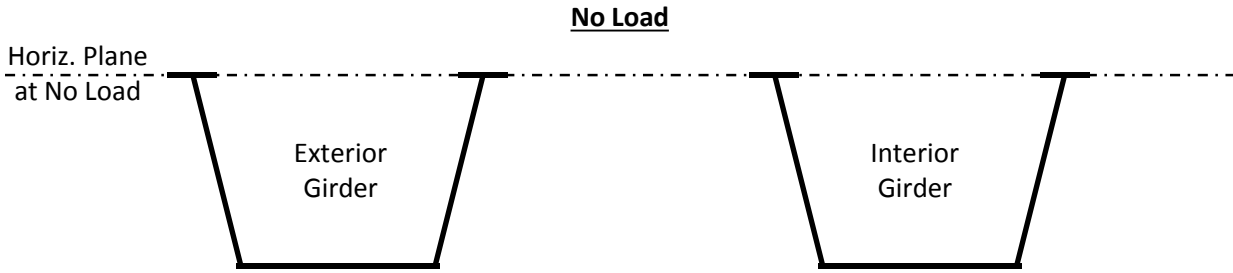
No Load – Unconnected Steel Tub Girder Twist – Section A-A
